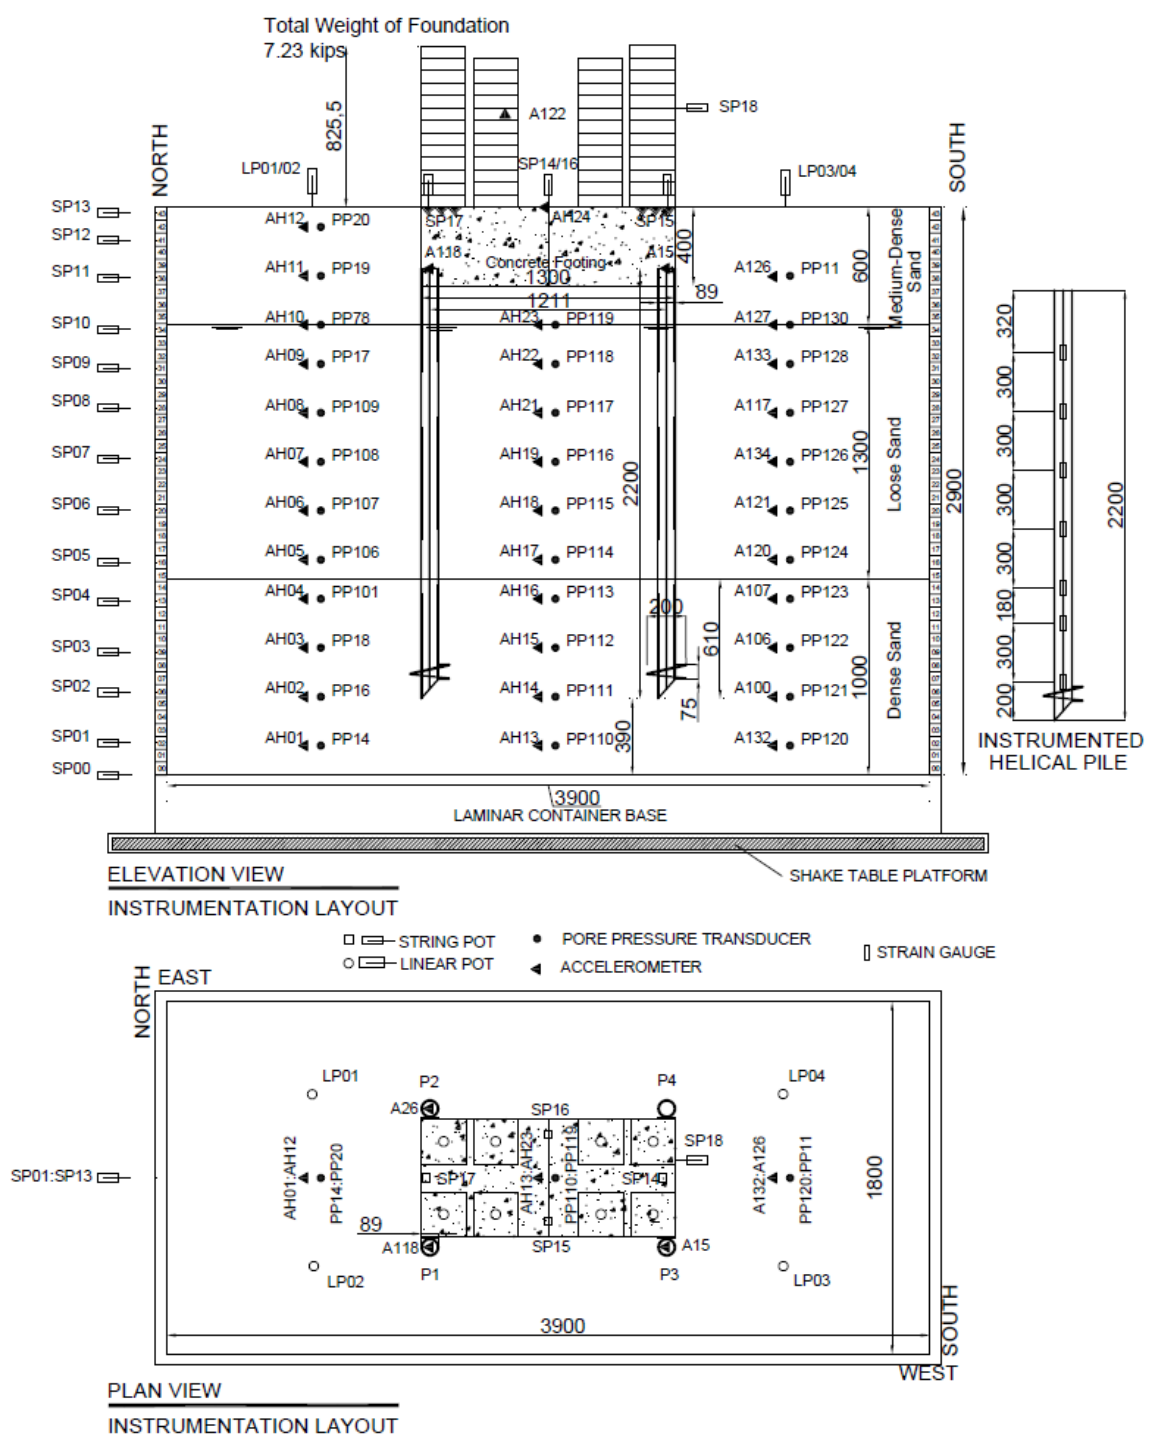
Elevation and plan view of instrumentation layout for the Helical Pile test (all dimensions are in millimeters). Helical Piles Specifications and Instrumentation
